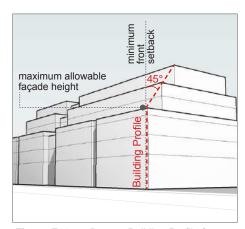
45-Degree Building Profile for Floors above the Maximum Allowable Façade Height
